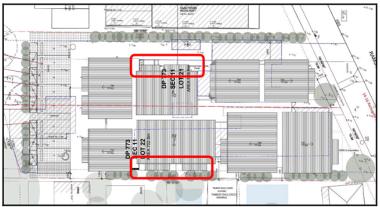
Site plan showing side-facing rooms are set-in from the main building line
